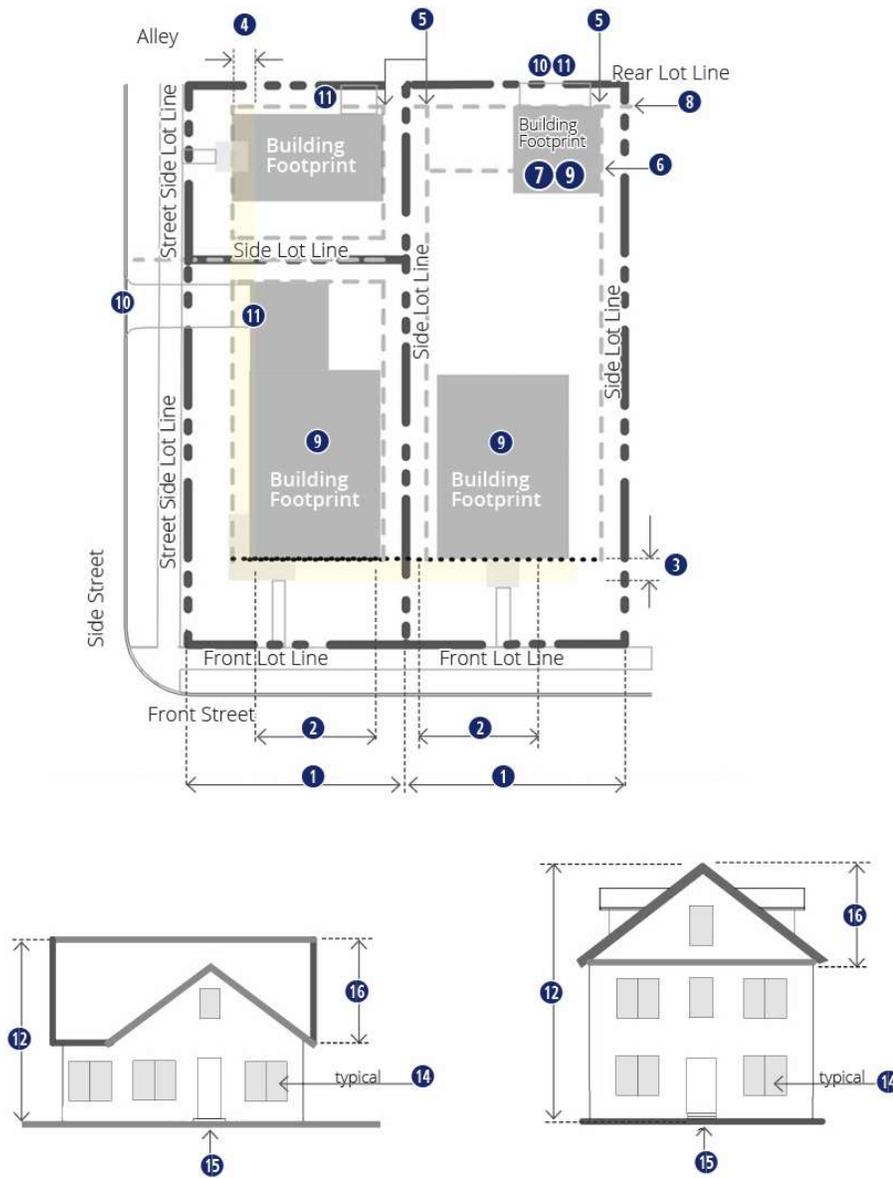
(5). N1 district diagrammatic plans and elevations.
